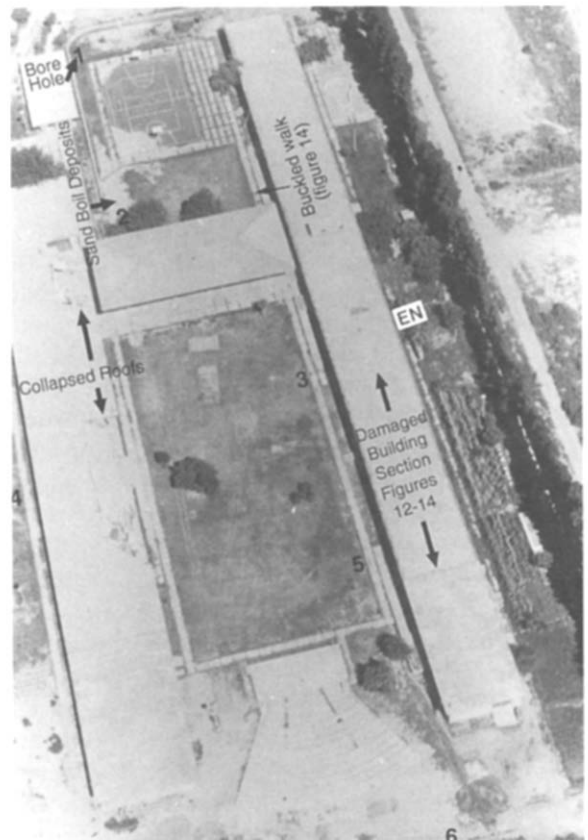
Aerial view of Escuela Normal, Cauete, showing damaged building section, bore hole locations and other pertinent features. View looking west.
